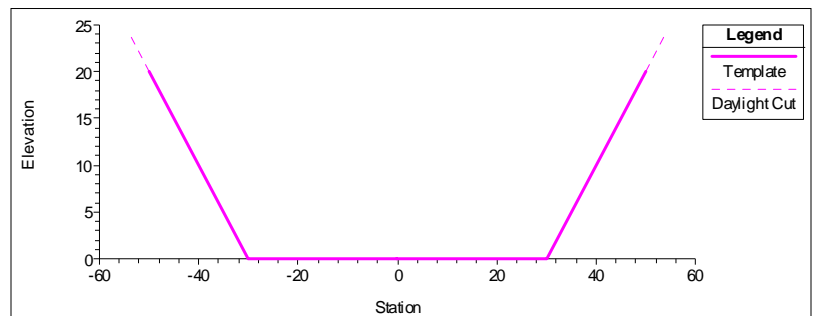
TYPICAL CROSS SECTION OF IMPROVEMENT (ELEVATIONS IN NGVD)
